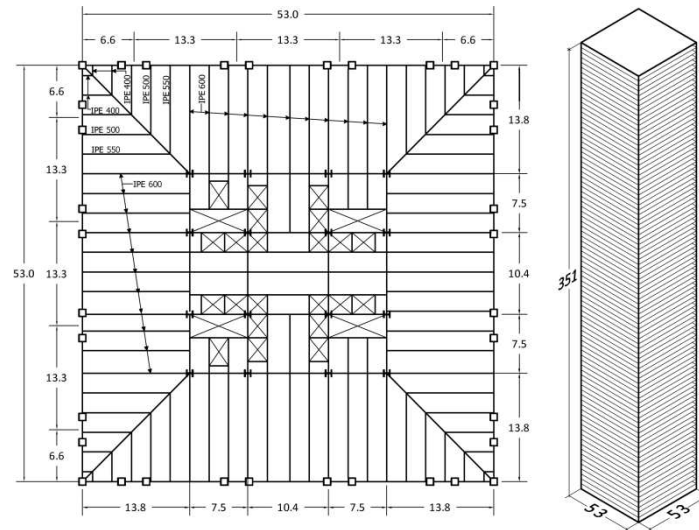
Building model : a) overall dimensions b) floor framing plan
